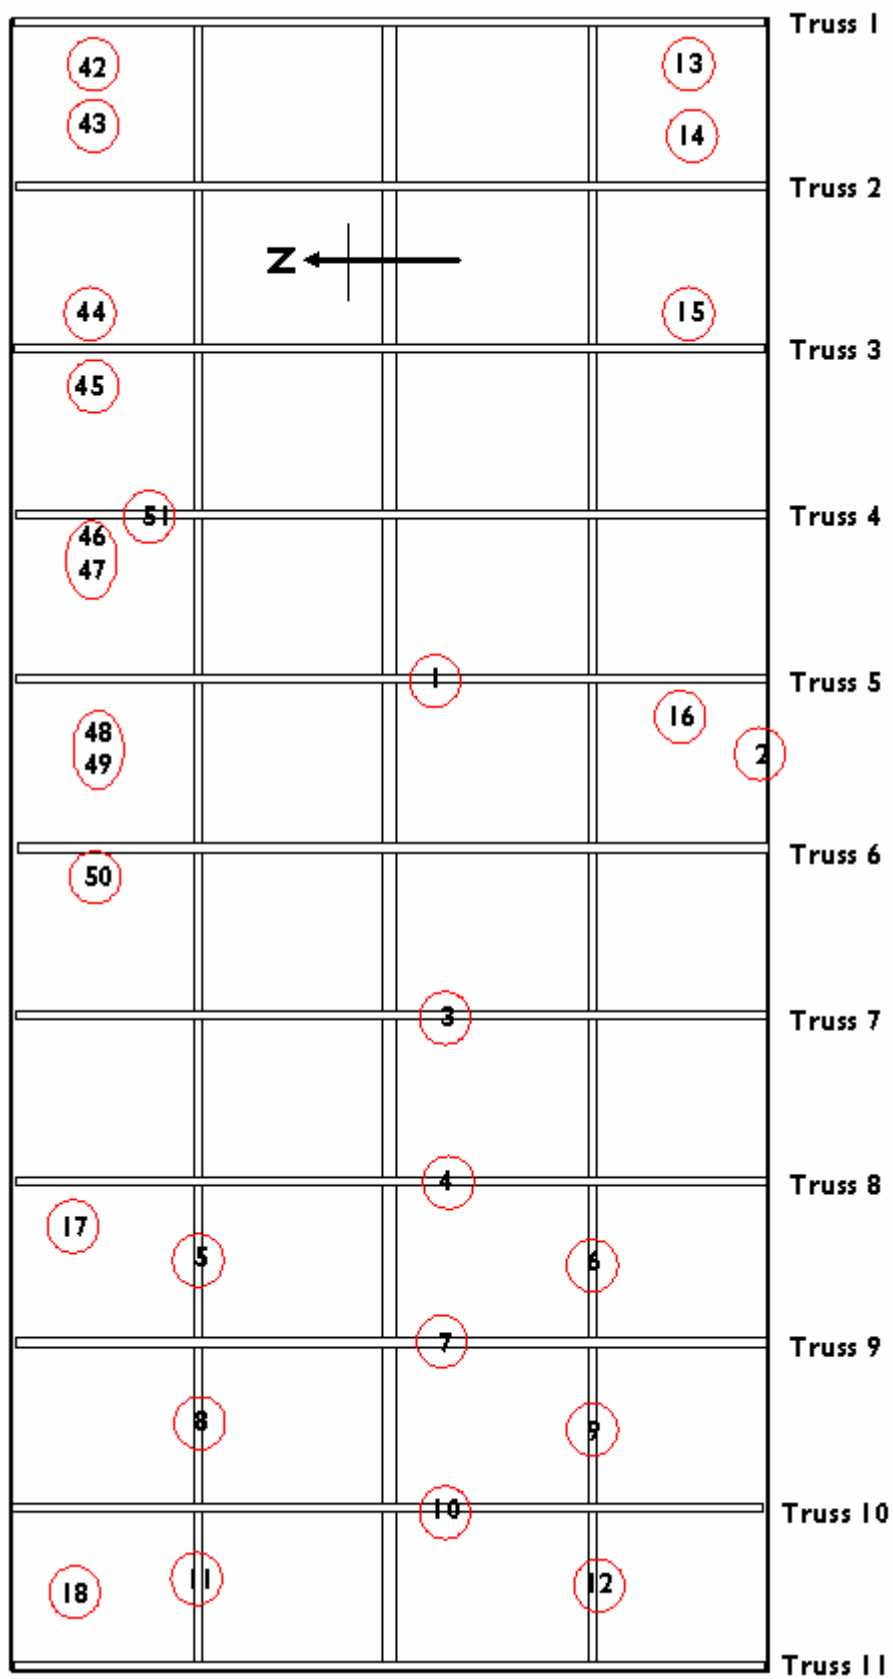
Plan of the south aisle roof to show position of sampled timbers
